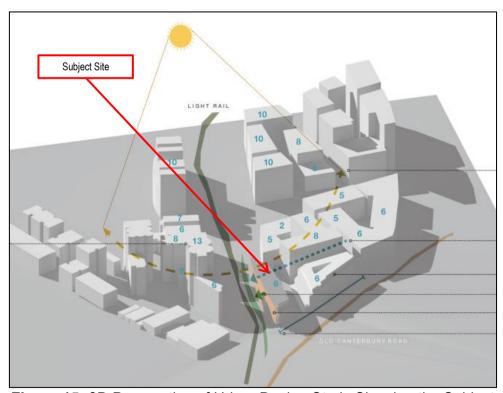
3D Perspective of Urban Design Study Showing the Subject Site and the Surrounding Context
